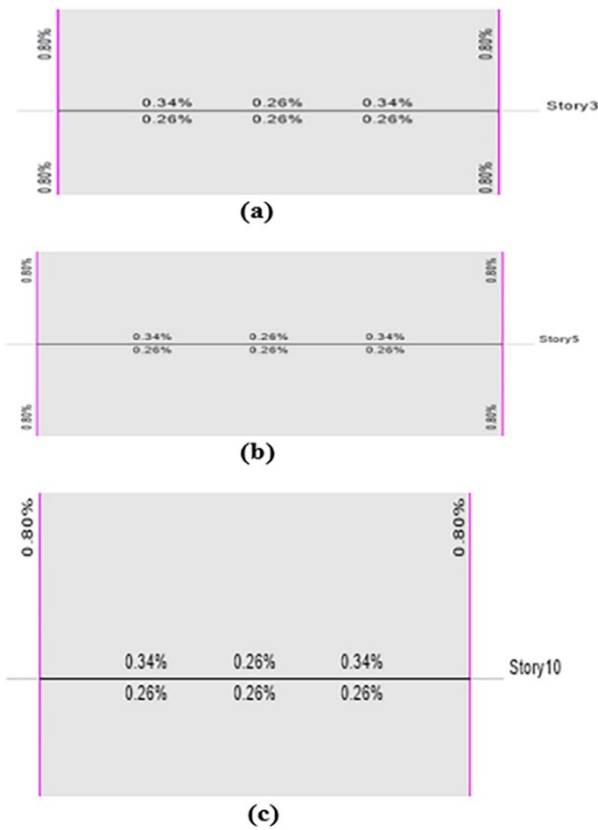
Steel Reinforcement a) G+3 Building b) G+5 Building c) G+10 Building
